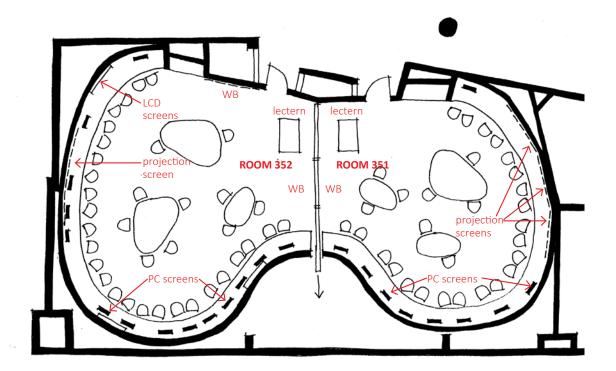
CTLC, Level 2, Rooms 351 & 352 Furniture Layout Source: Author
